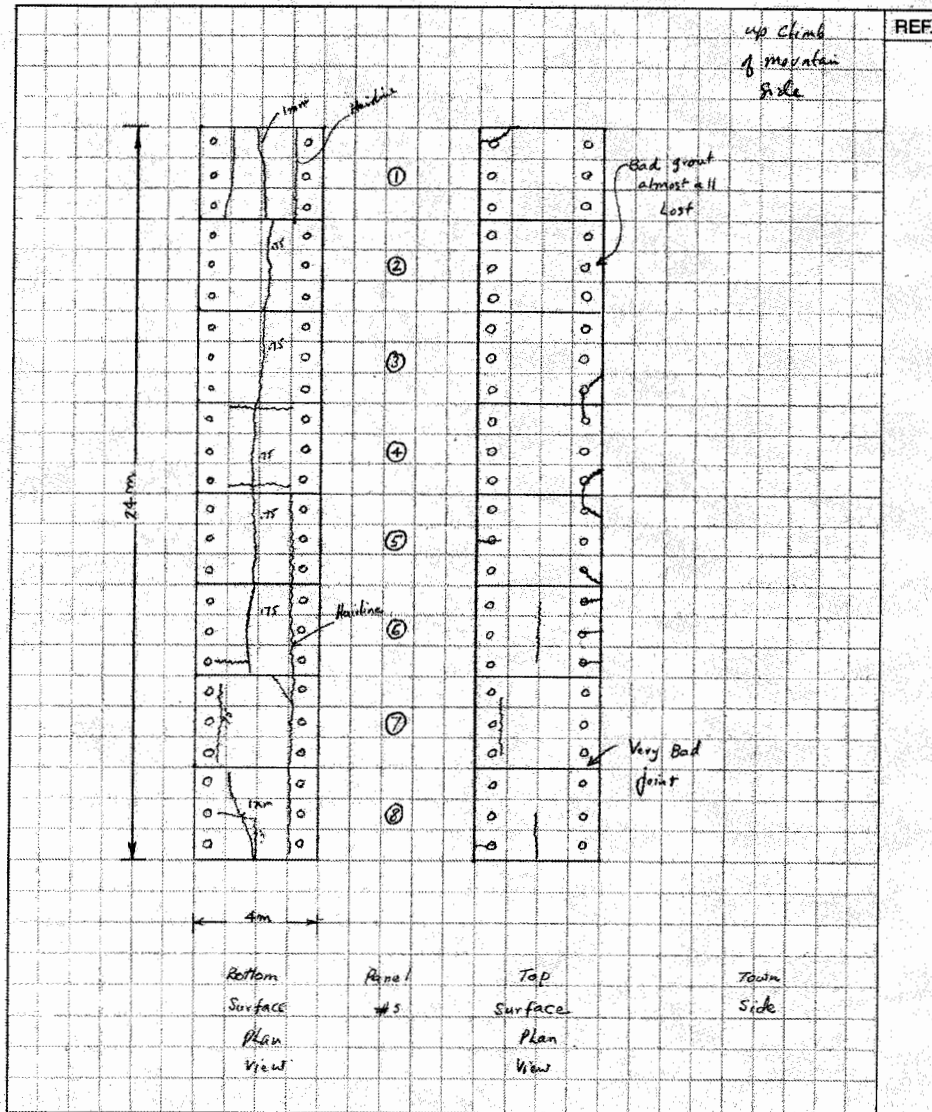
Sketch of Crack Pattern in Forestry Bridge Deck July, 1999
